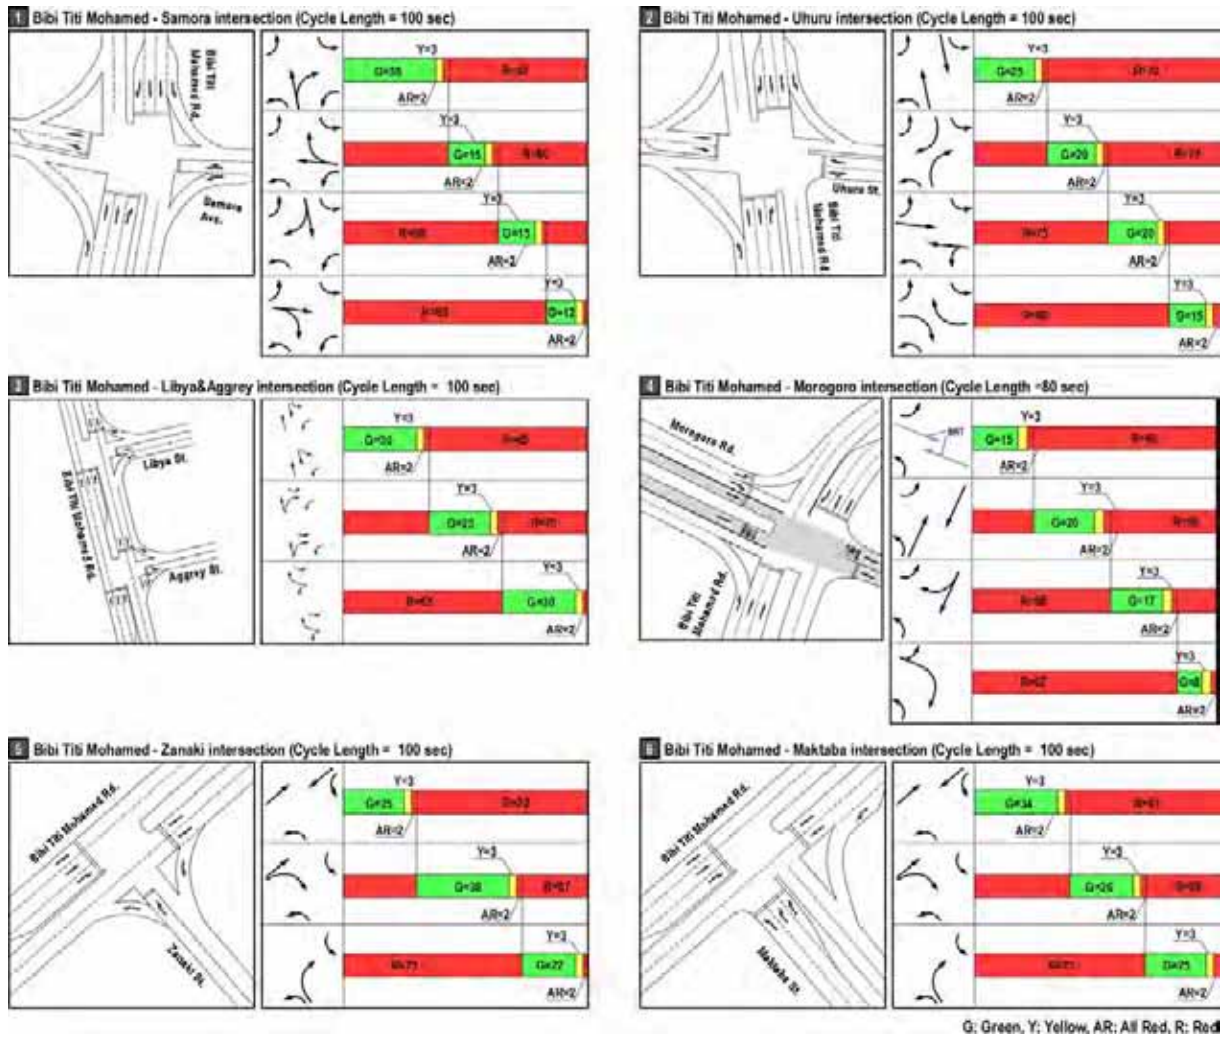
Intersection Improvement Plan (Part 1 of 2)
